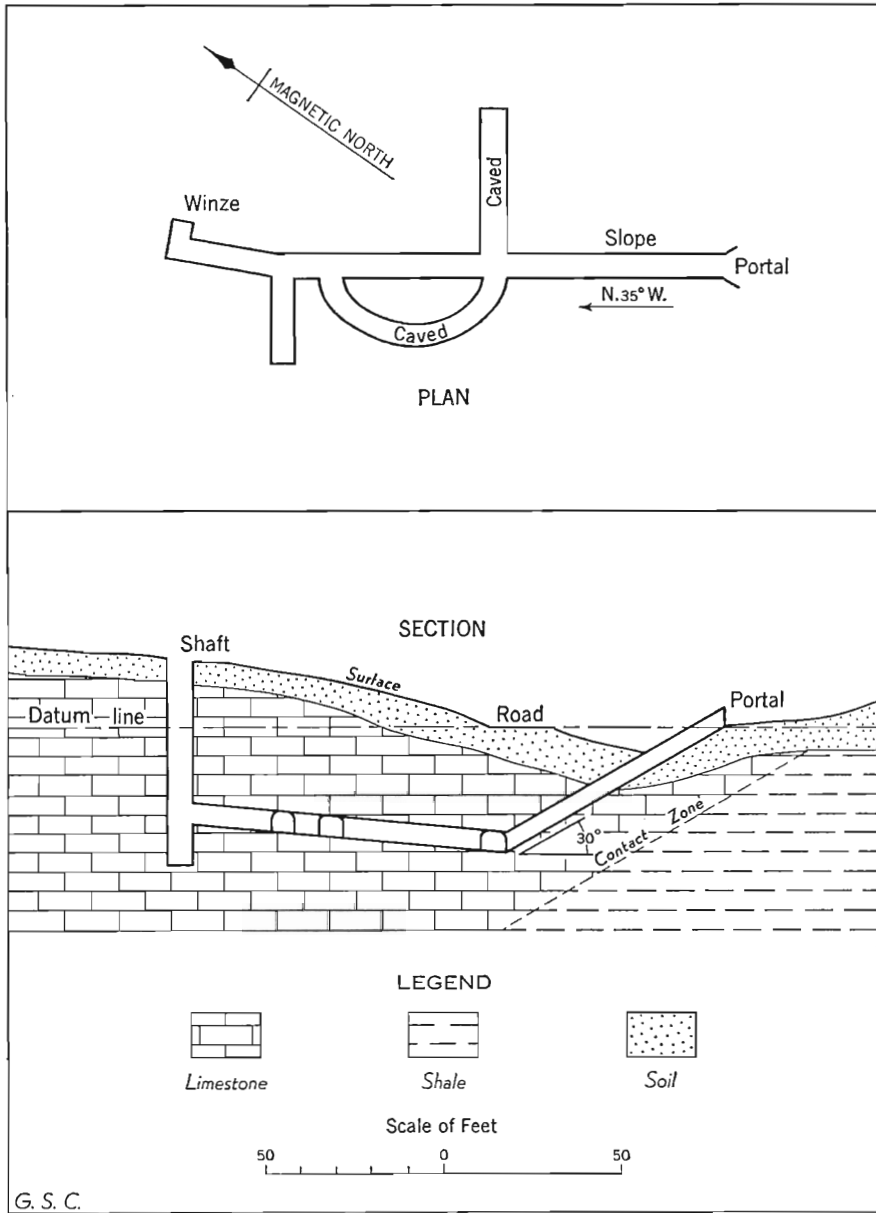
Plan and vertical section of underground workings at East Mountain manganese mine.
